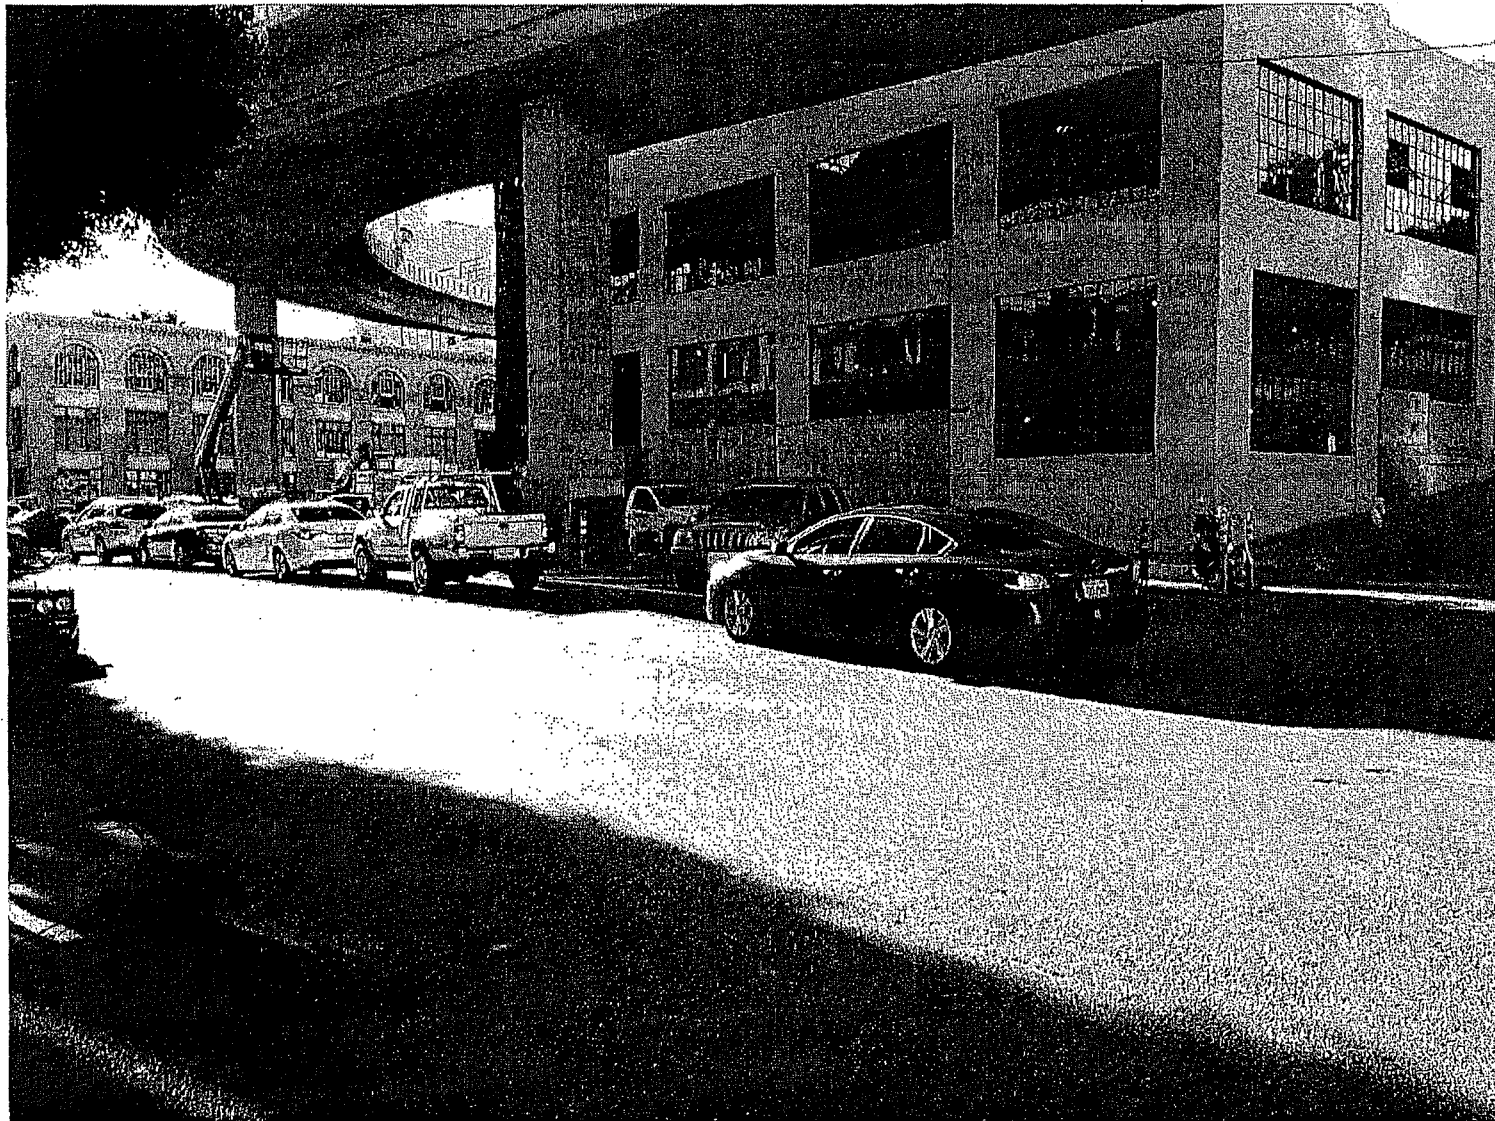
Existing building on project site viewed from across Bryant Street, Unmarked crosswalk across Bryant Street at Rincon Street, looking north – February 13, 2015
